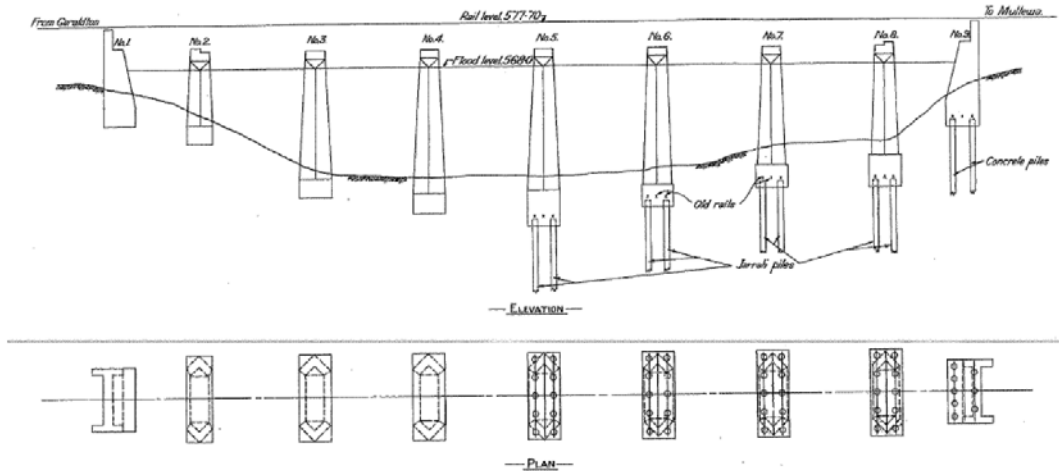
Foundation details for Eradu bridge as per design drawing (1934).
